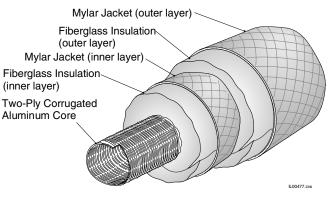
Typical Supply Tubing Construction (R-6 and R-8)
